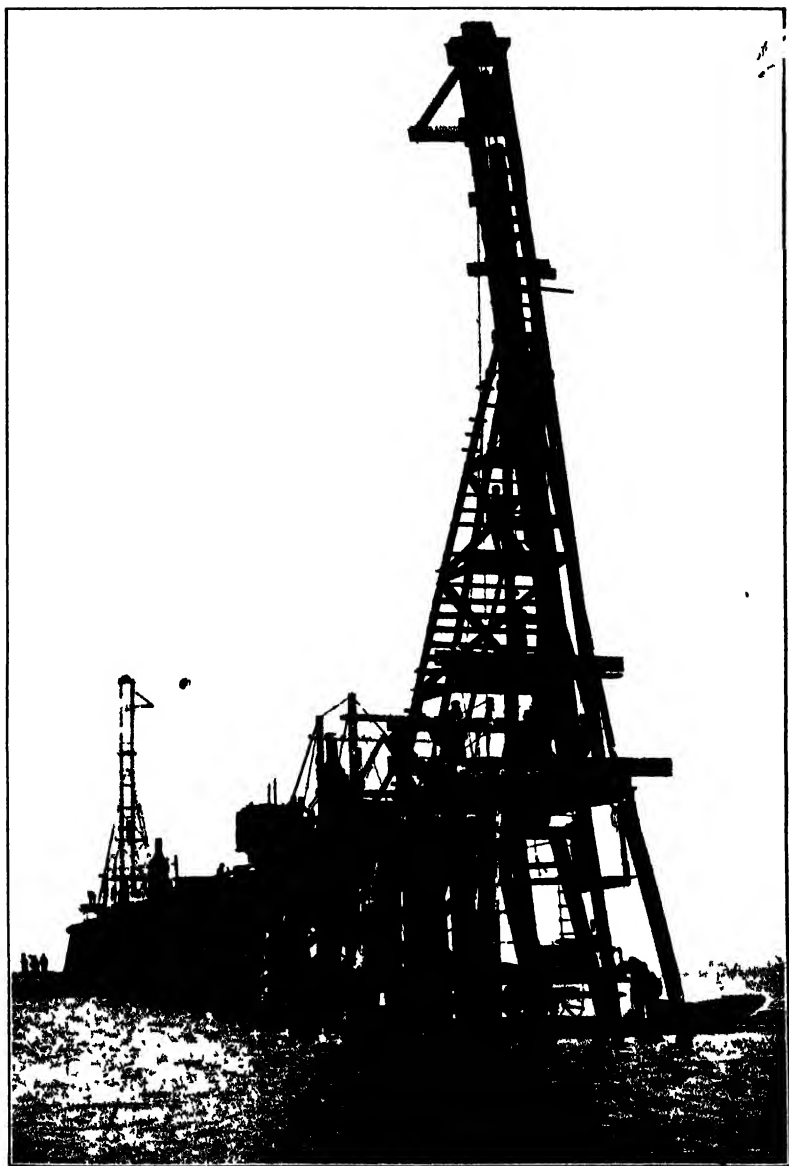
Driving Batter Piles on the Trestle Approach to the Central California Railway Bridge over San Francisco Bay at Dumbarton Point, August, 14, 1907. *(Facing p 42)
